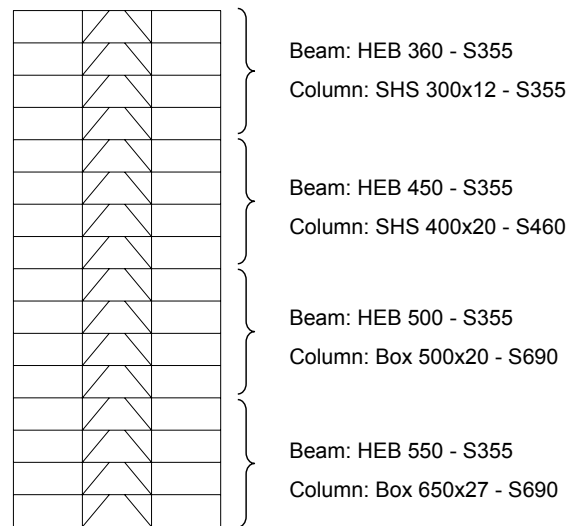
Member cross section of the 16 storey D-EBF designed for soft soil
